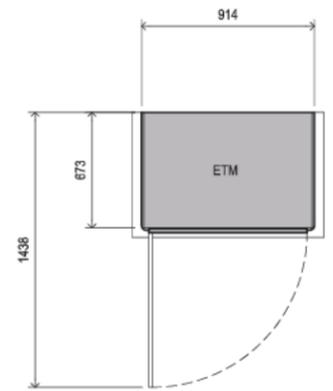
Typical Exit Ticket Machine (ETM) Detail Plan
